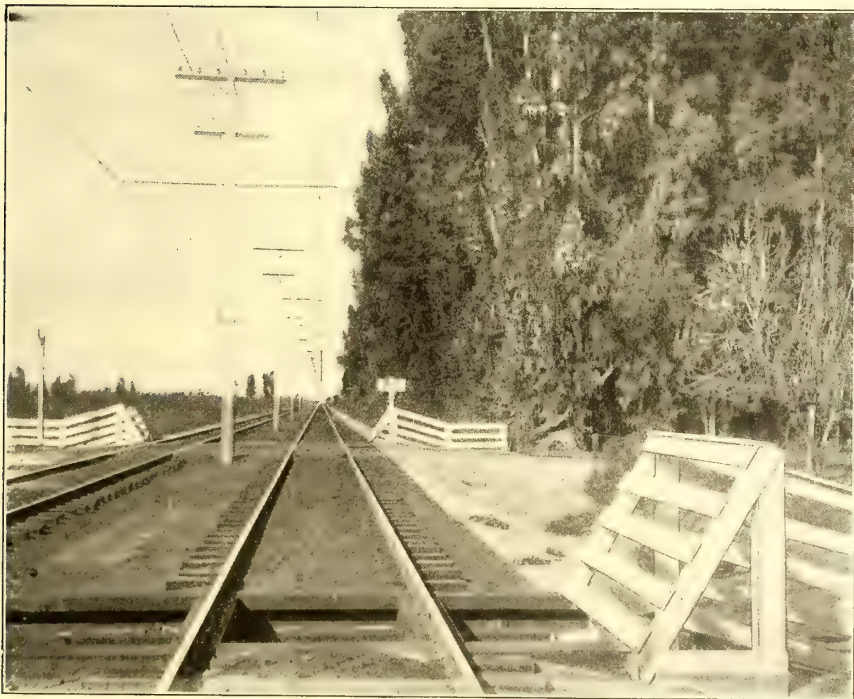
VIEW ON LONG BEACH LINE, SHOWING ROAD CROSSING
